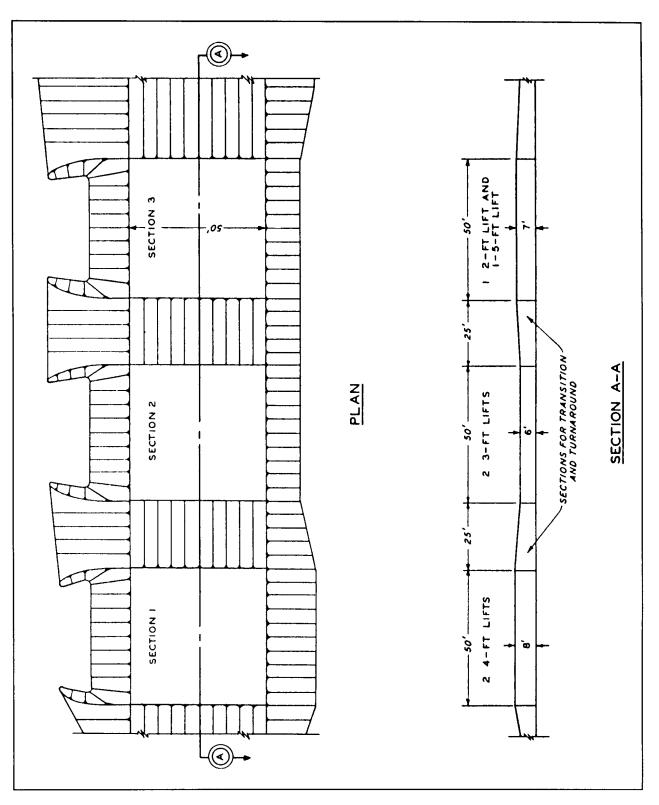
Beltzville Dam, plan view of the rolling pattern
